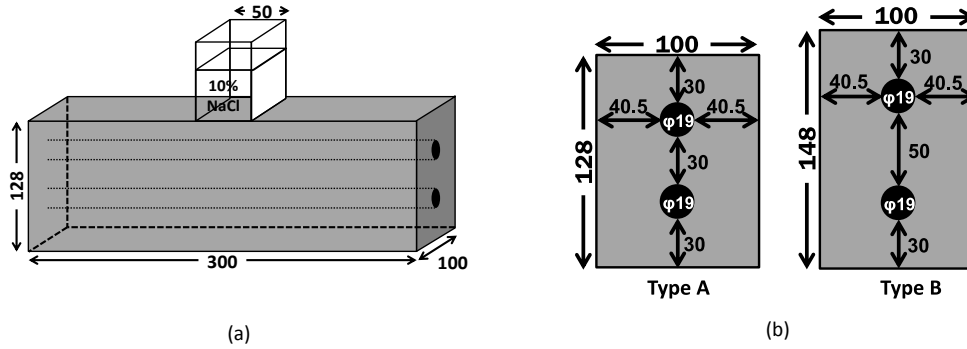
(a) RC slab with 10% NaCl solution on top; (b) RC slab of type A (100X128X300 mm) and type B (100X148X300 mm) specimen [19]
